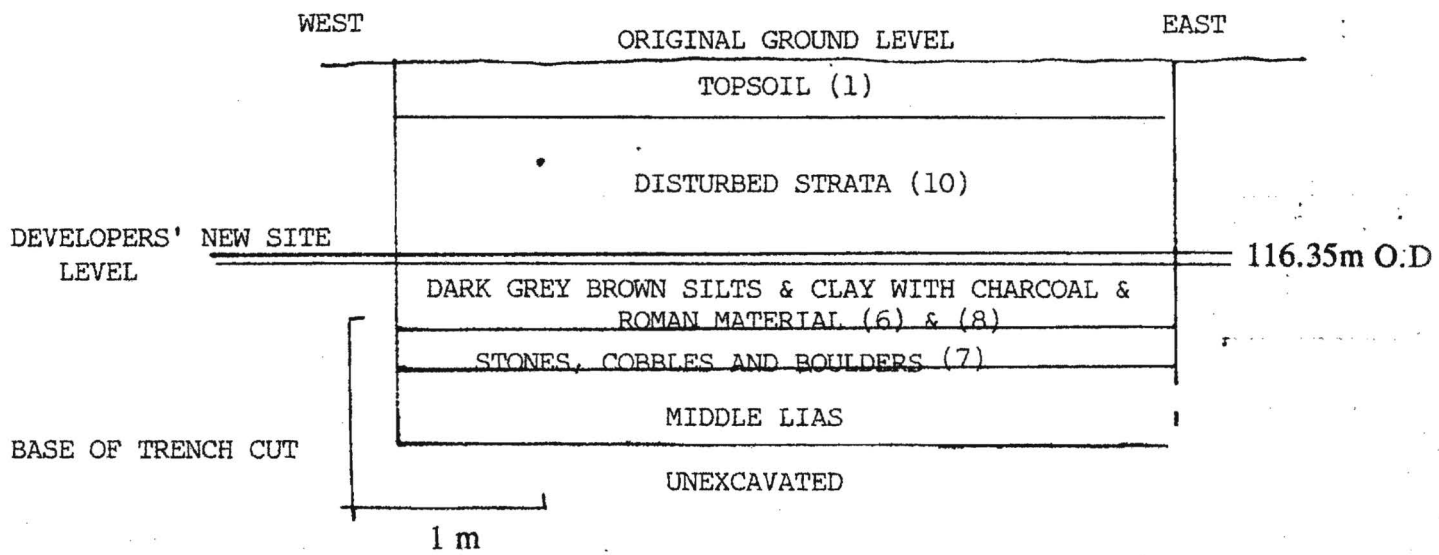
Section a-a (Fig.3) through northern foundation trench of house 1.
